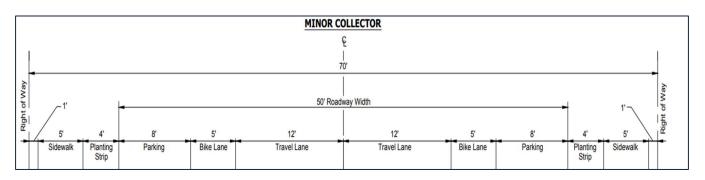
STANDARD MINOR COLLECTOR CROSS-SECTION
